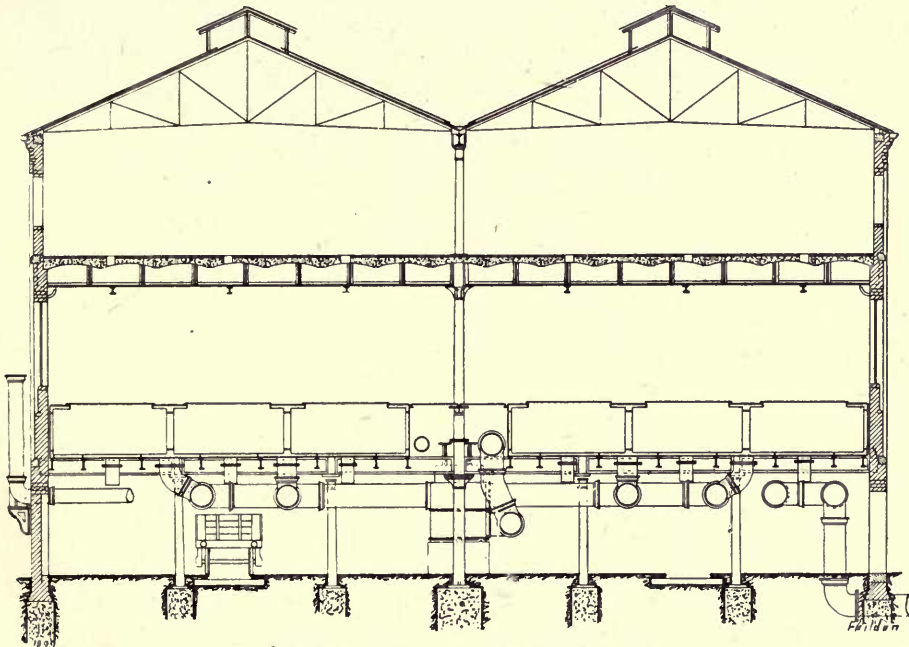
SECTION THROUGH PURIFIER HOUSE AT THE GRIMESTHORPE GASWORKS, SHEFFIELD.
